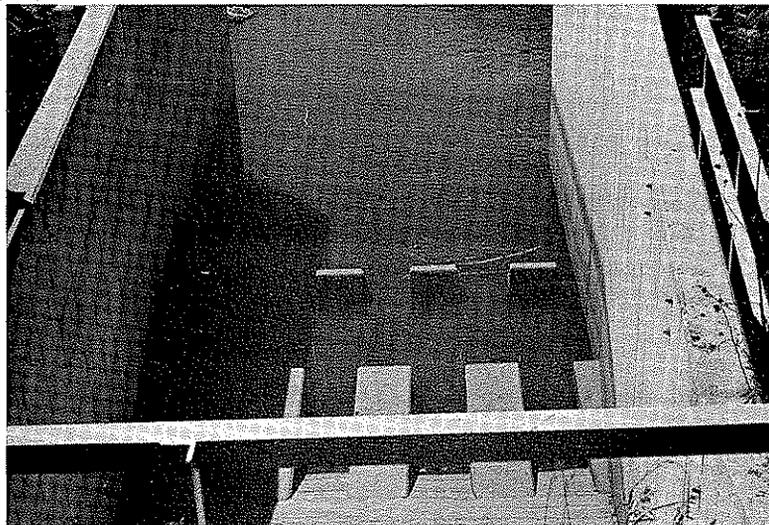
Chutes and baffle blocks for energy dissipation on downstream side of box-culvert type of grade stabilization structure.
